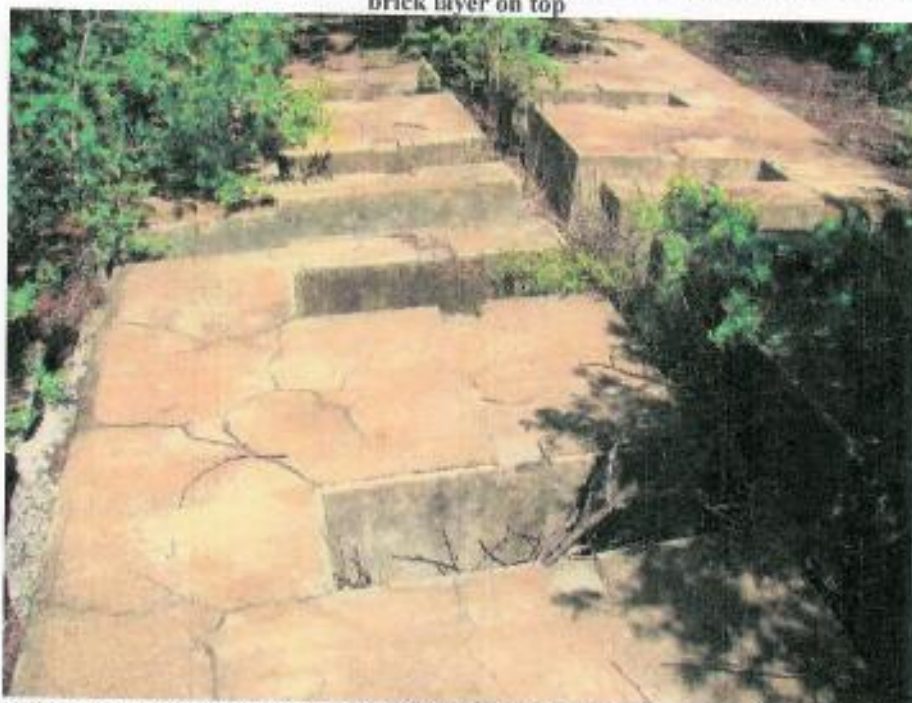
The south-western section of this building has a similar stone foundation but with a cement slab with deep slots on top. This could possibly have been the earlier garage building.
